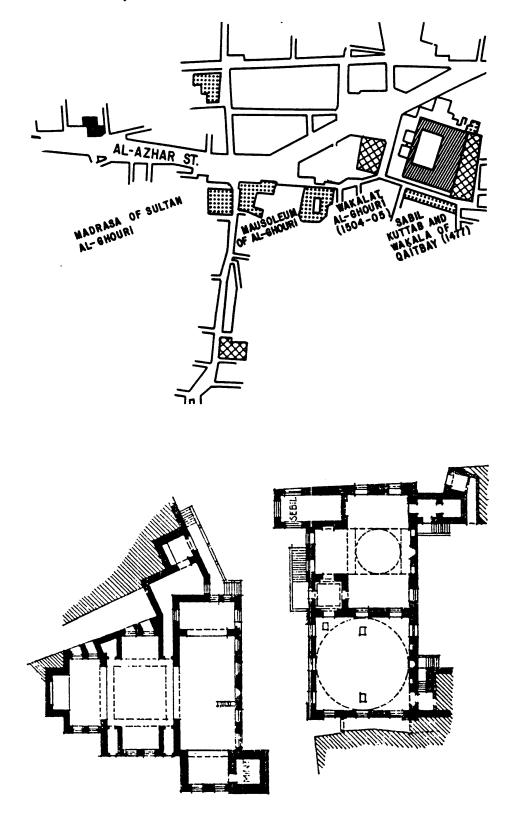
Madrasa/mausoleum of al-Ghūrī: plan (Branderburg) and site plan (Parker and Sabin).
